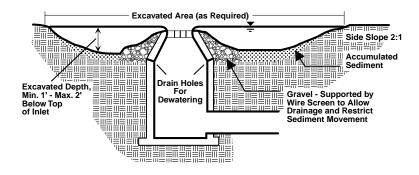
Cross section of Excavated Drop Inlet Protection
